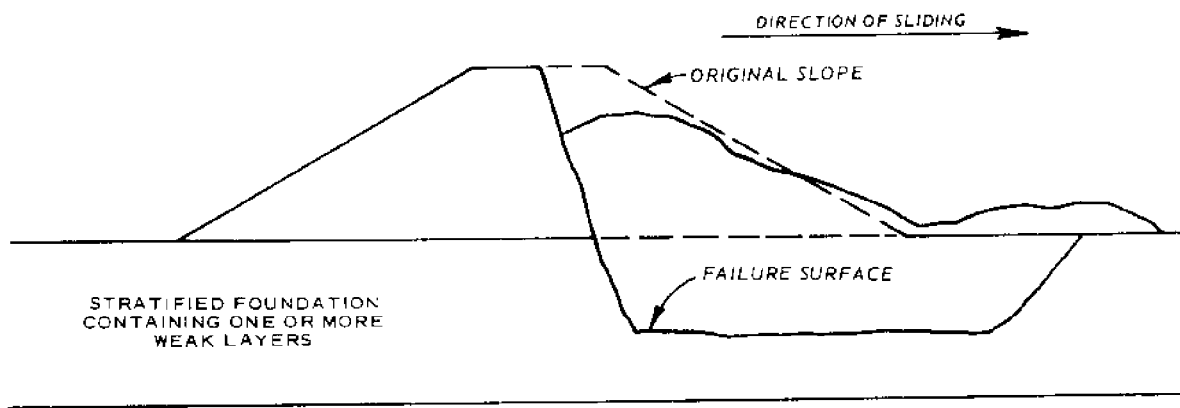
Translatory Failure in Dike and Foundation
